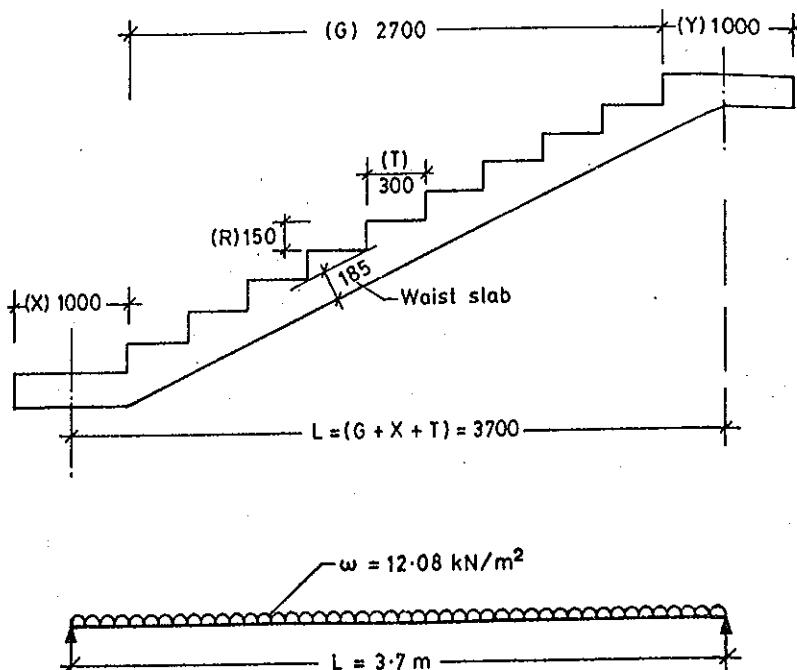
Dimensions and Loading on Stair Case Flight
